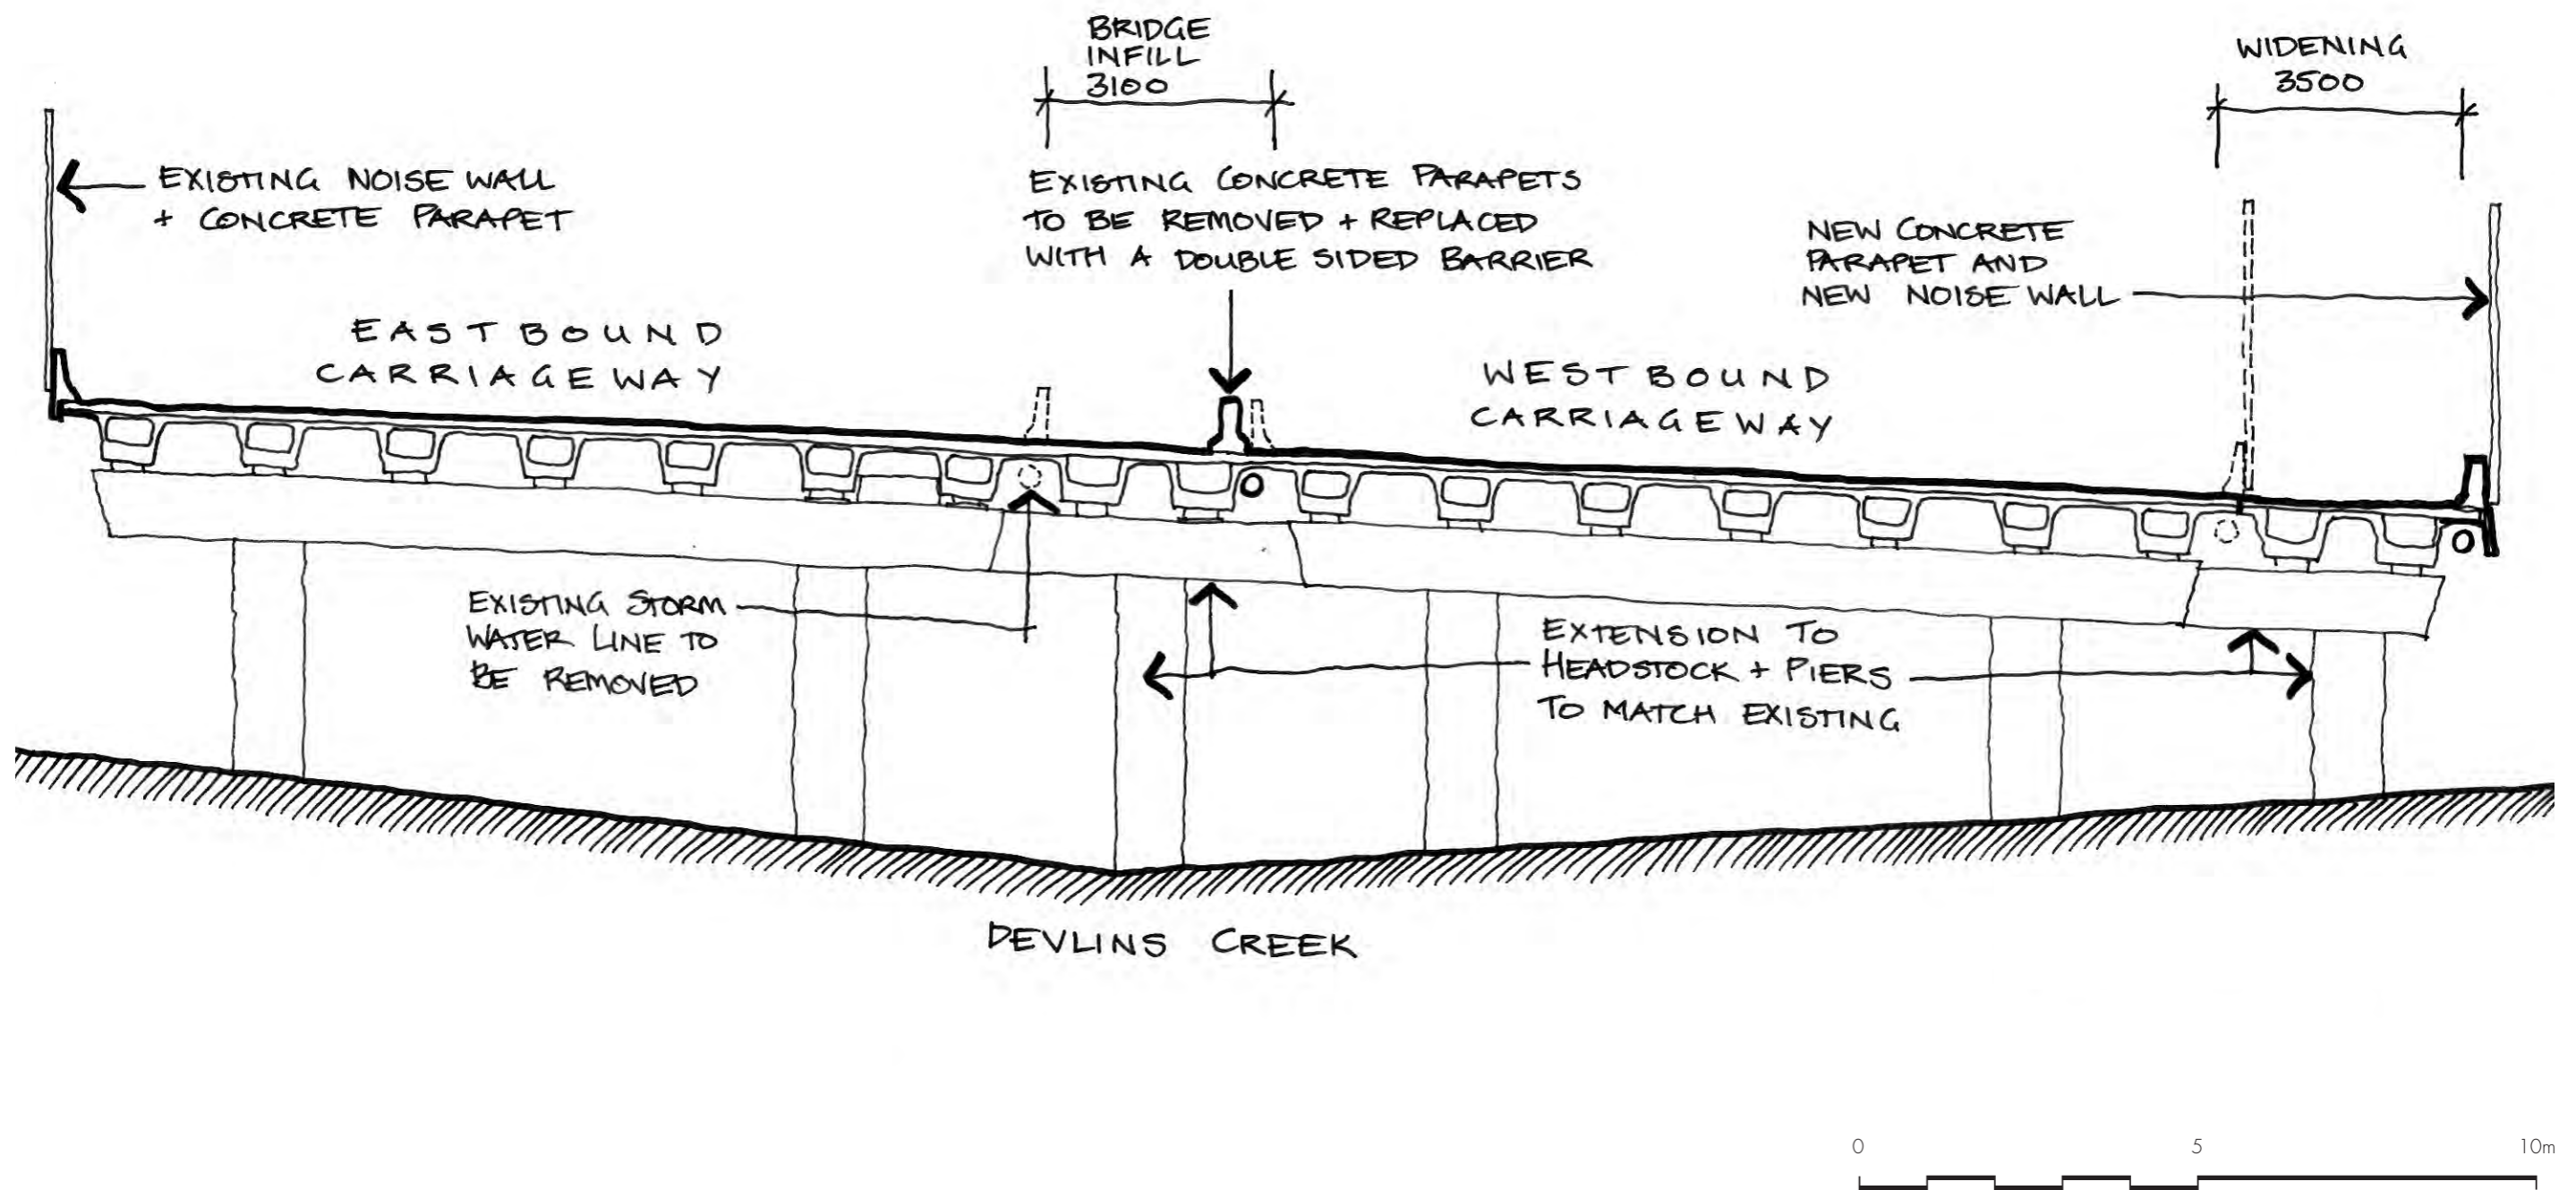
Bridge 2.6 Devlins Creek Bridge - Cross Section
